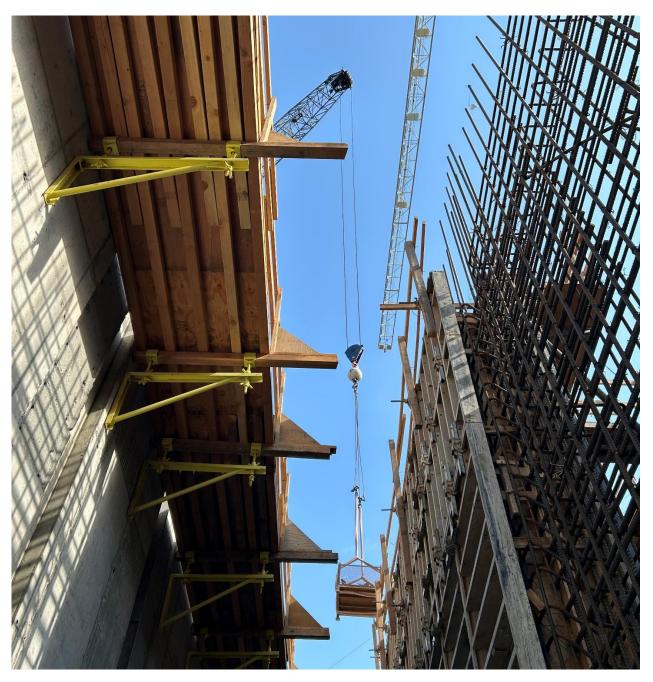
View looking upward from the UV-CCB Facility showing the two cranes at work within the same work area. The close quarters on the construction site require constant communication and vigilance by construction personnel to maintain a safe worksite.
